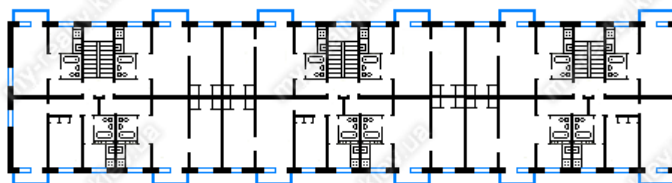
Typical floor plan of Khrushchovka series 1-464
